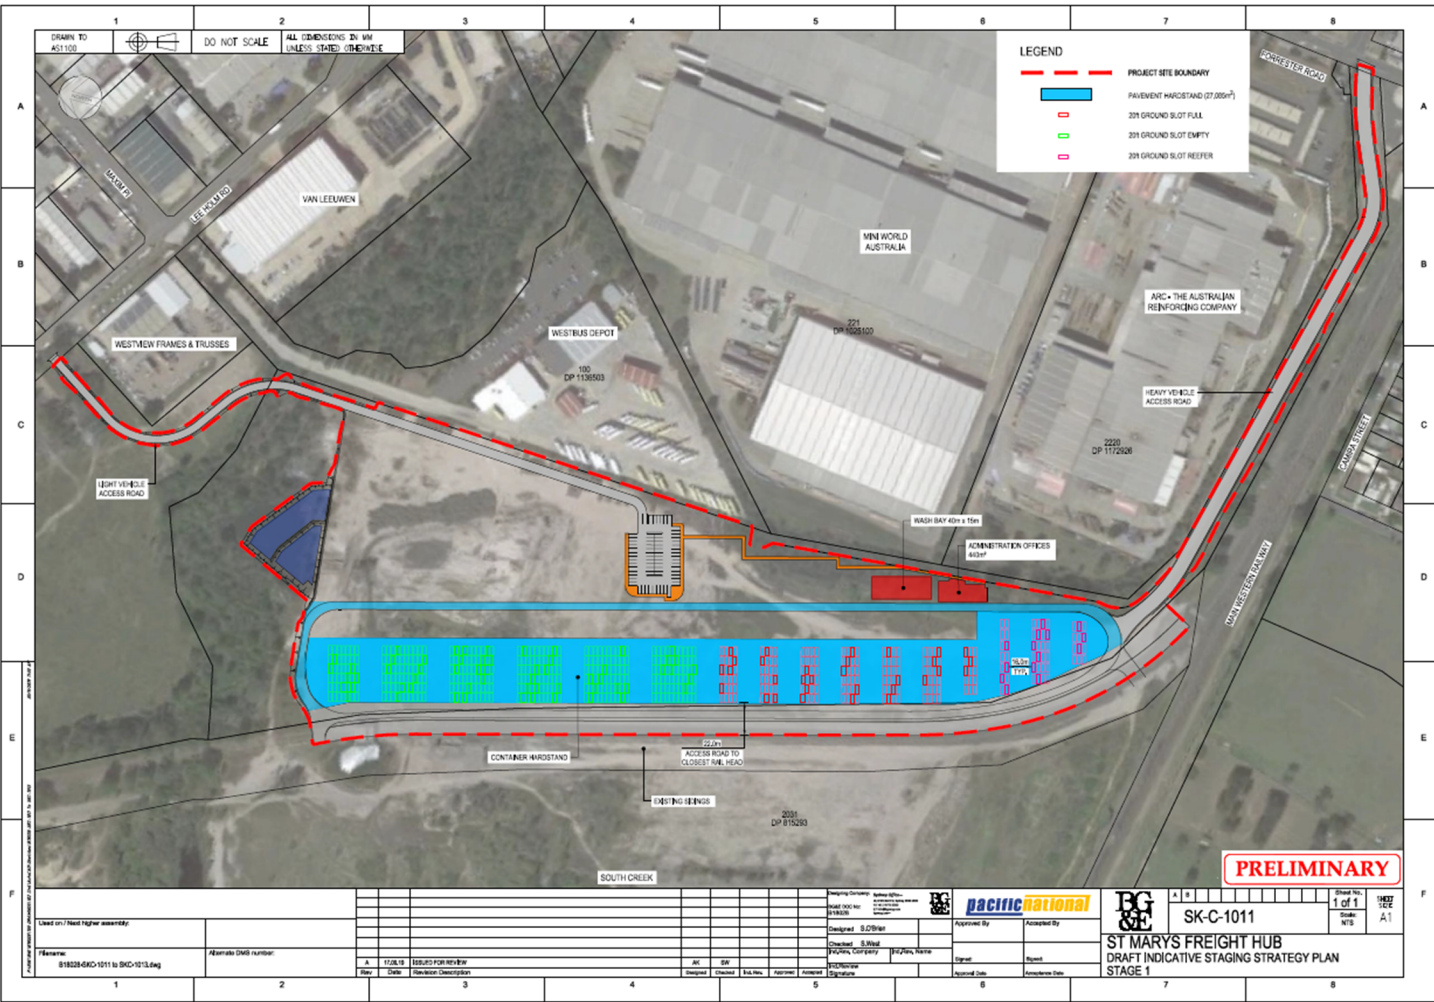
UPDATED – CONSTRUCTION STAGING PLAN - STAGE 1
